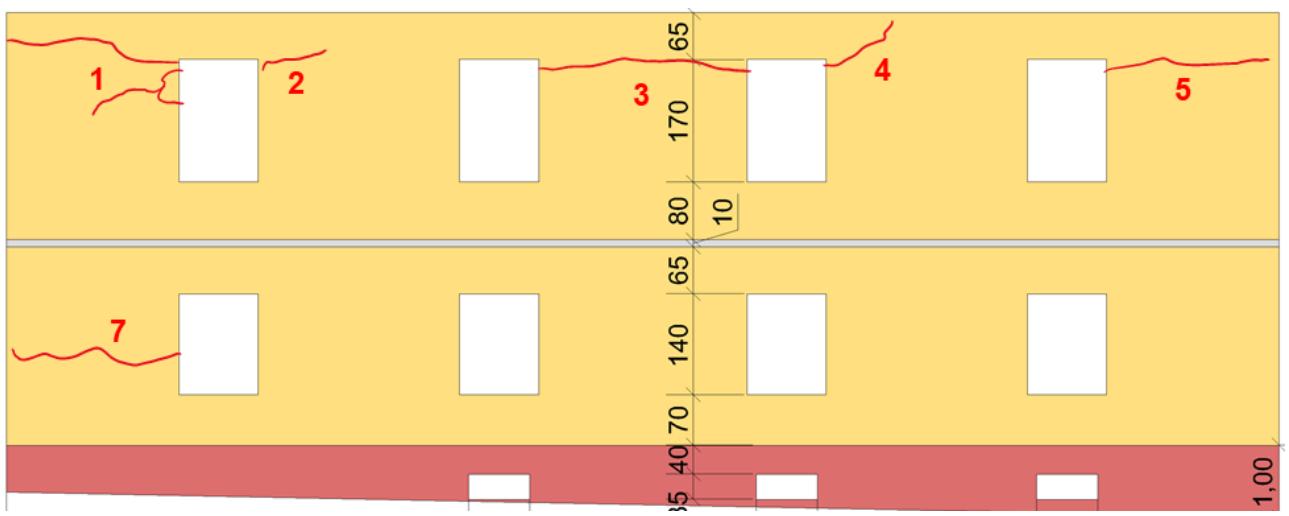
OOP mechanism east facade: Relevant cracks that indicate the mechanism, east facade
